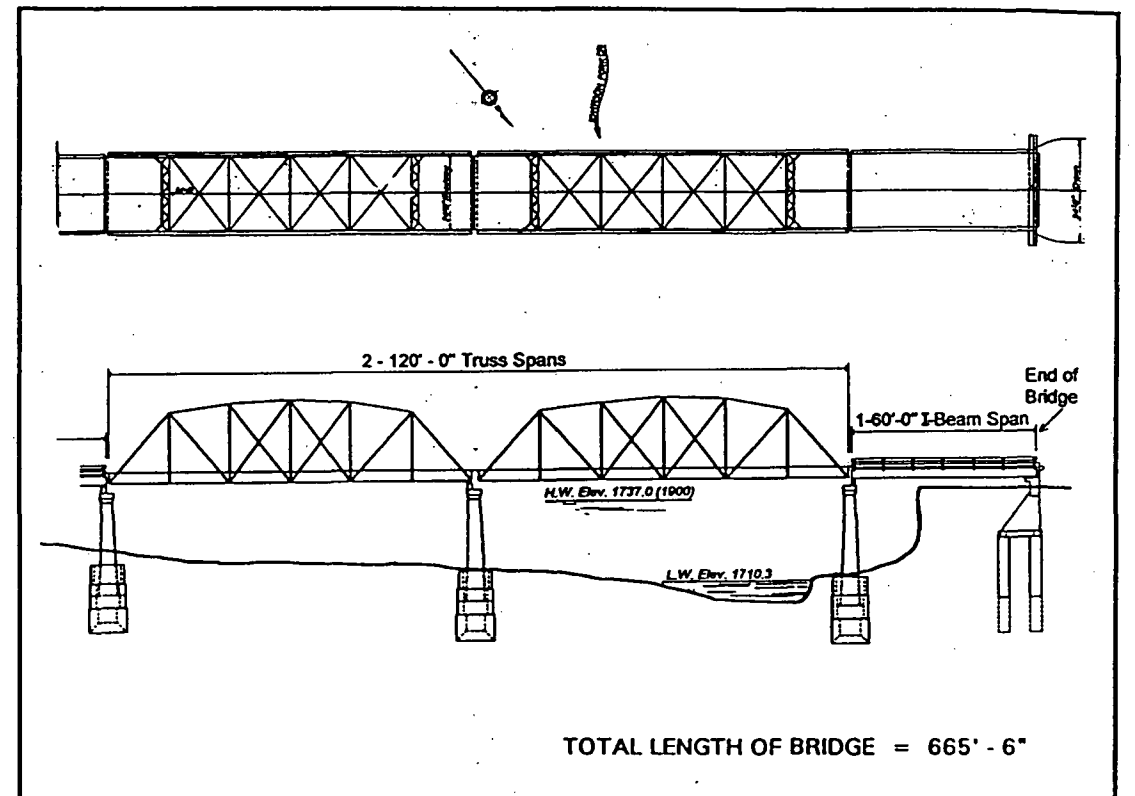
Elevation of the Johnson Fork bridge as shown in the 1937 plans.
